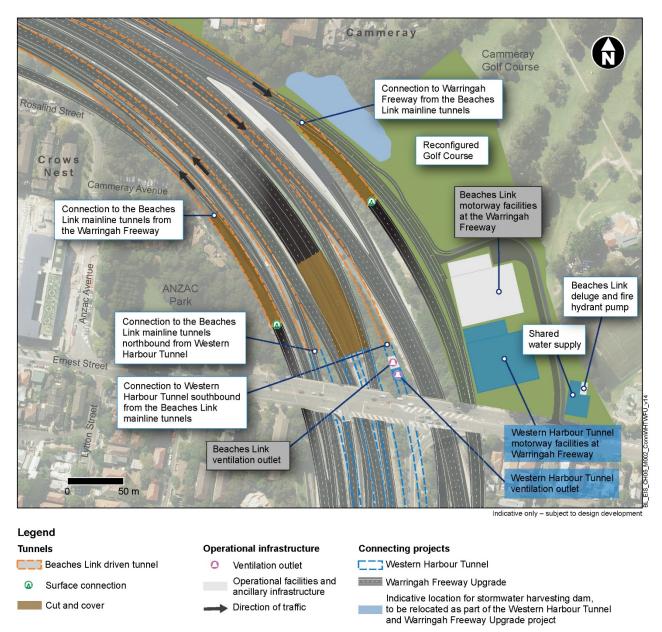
Indicative tunnel-to-tunnel connections to the Western Harbour Tunnel and Warringah Freeway Upgrade project tunnel
